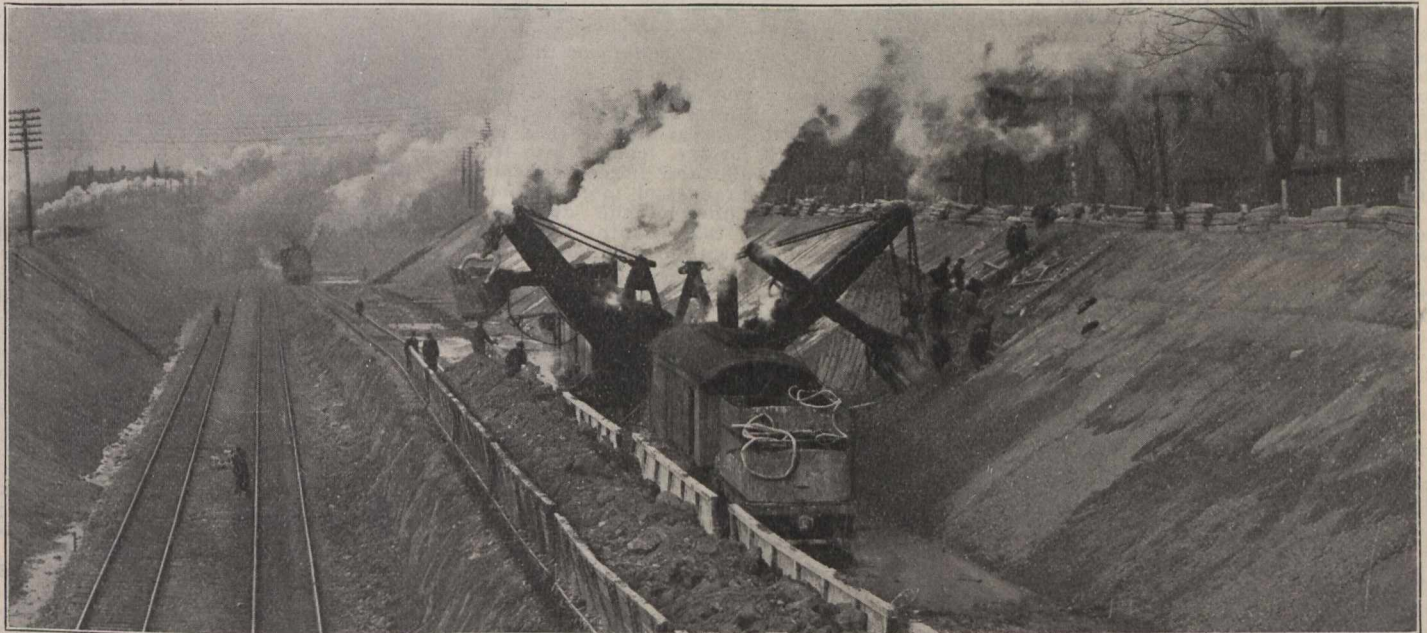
Looking West from Dowling Avenue Bridge, Dec. 1, 1911.
